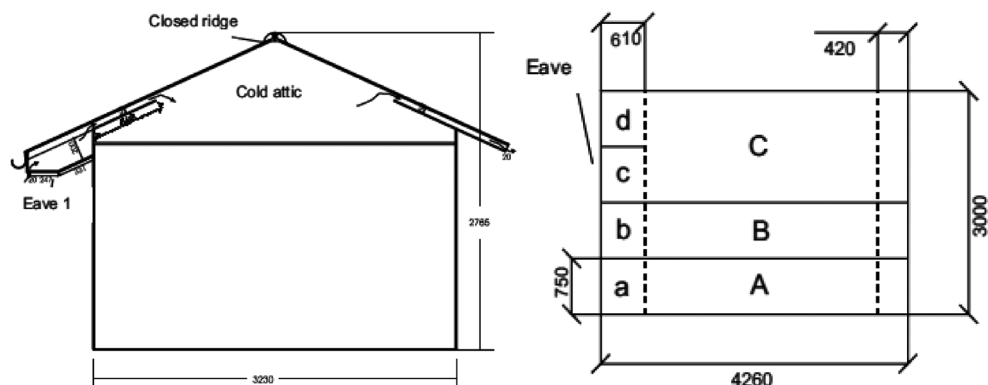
Section and schematic top view of the windward roof pitch with division of the ventilated attic and eave construction
